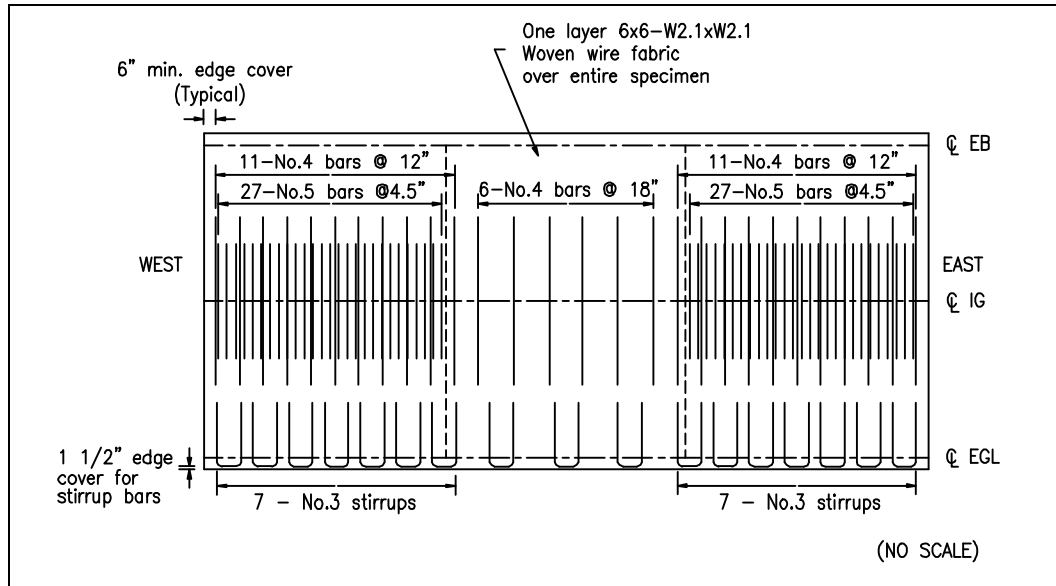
Haunched Girder Slab Reinforcement Layout
